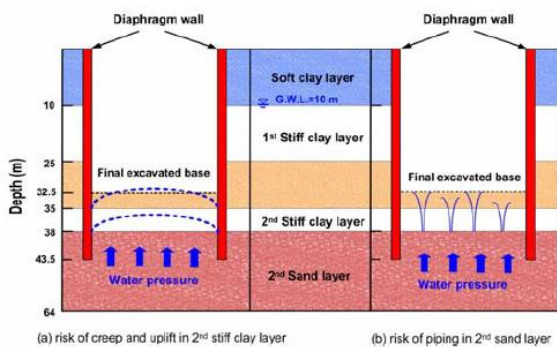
Construction risk of IDT shaft and the purposed jet grouting
